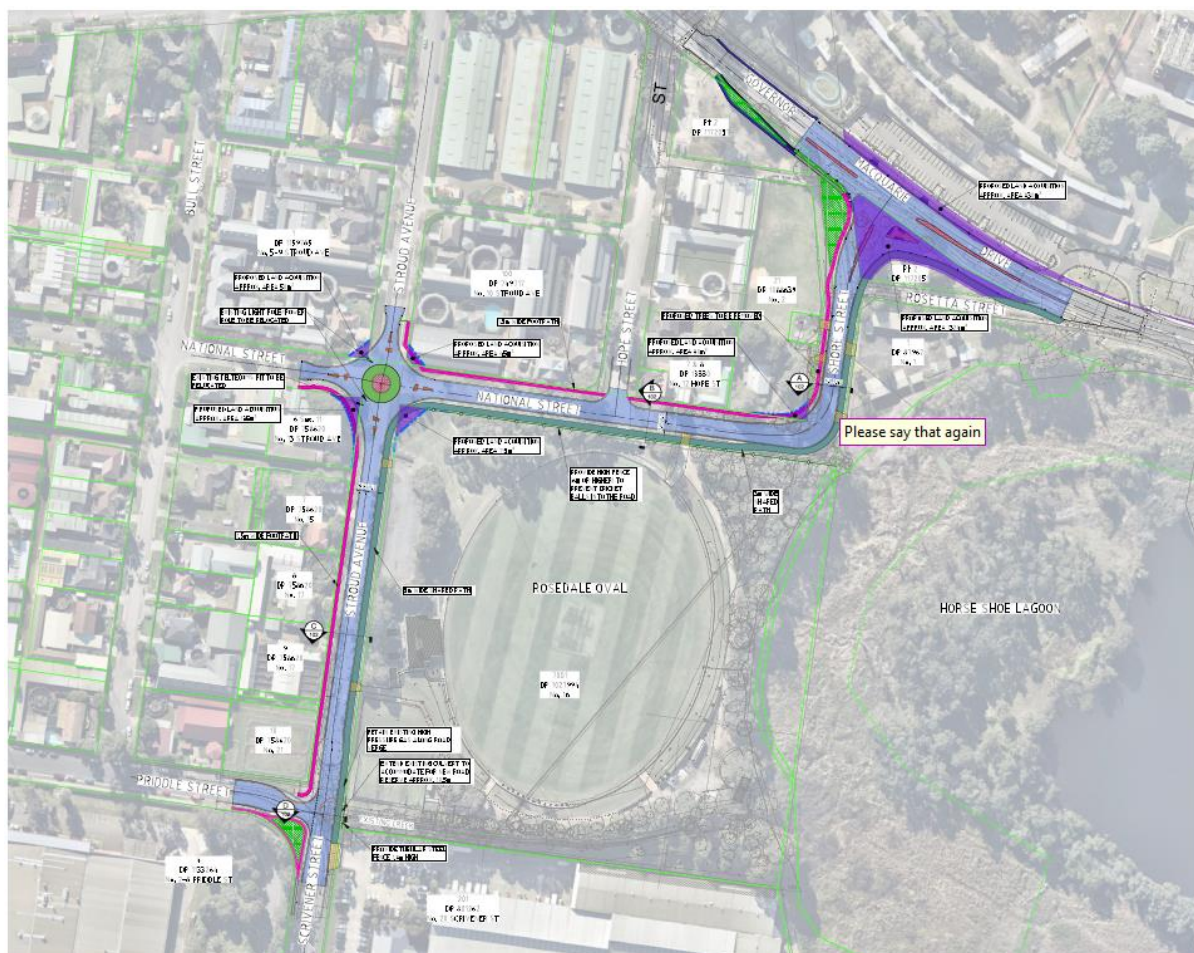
Alternative route for Manning Street bypass via existing roads: Stroud Avenue, National Street and Shore Street.
